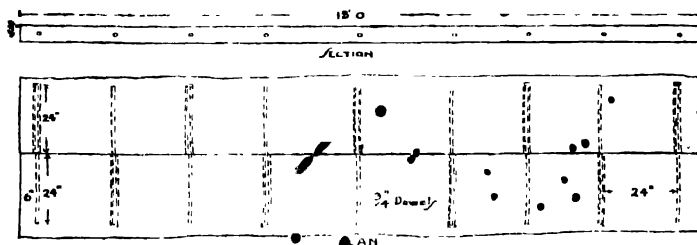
Method of Strengthening Transverse Joints by Steel Dowels.
